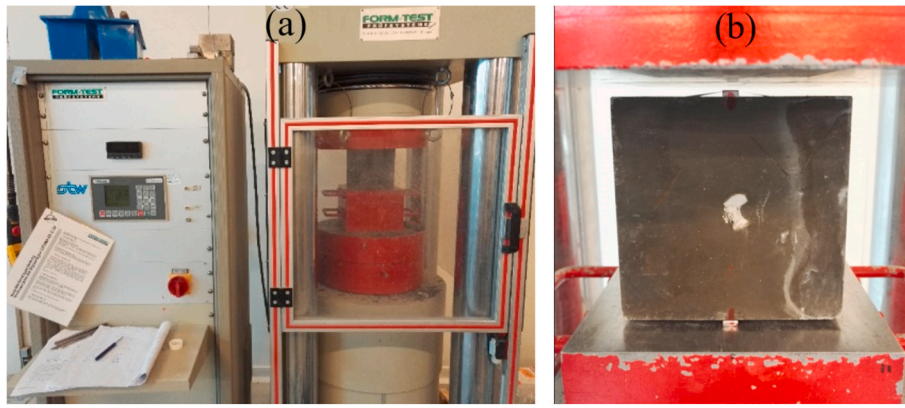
Specimens and set-ups of (a) compressive and (b) tensile splitting tests.
